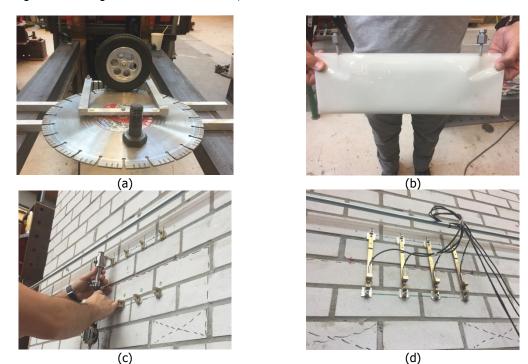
Testing procedure of the single flatjack test: (a) circular sawing machine; (b) pressure measurements film; (c) manual measurements of the initial distance between gauge points; (d) LVDTs arrangement.
